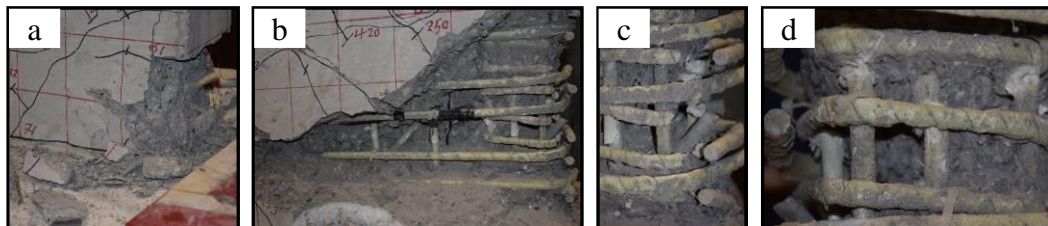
Failure progression of specimen GX4: (a) spalling of concrete cover; (b) concrete crushing causing failure; (c) rupture of GFRP ties; (d) fracture of compressed longitudinal bars
